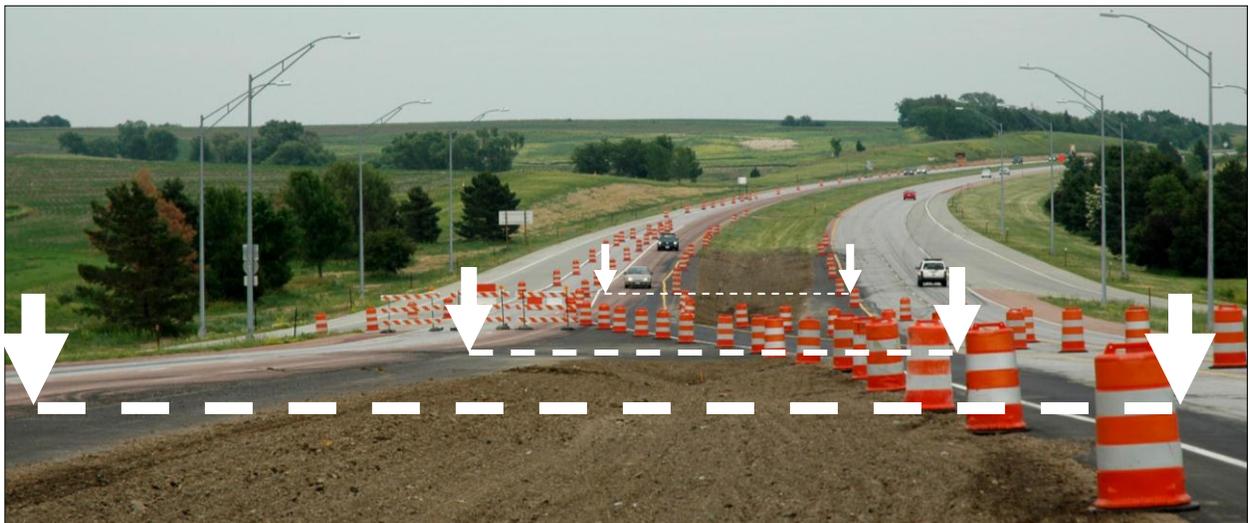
Controlling Edges of Existing Pavement Affects Geometry and Cross Section Slopes of Crossover Pavement
